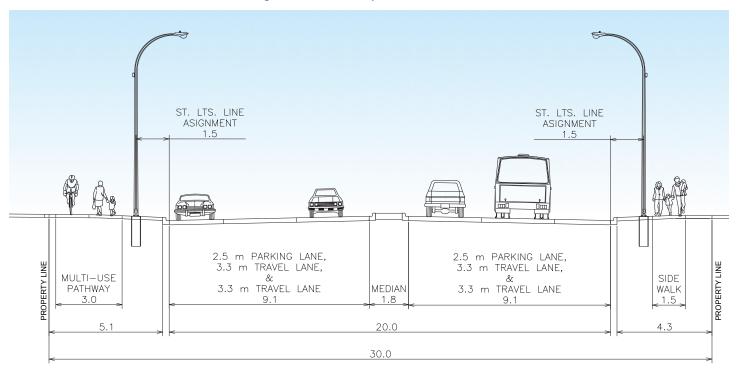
Conceptual Road Cross Section 47th Street at Fairmont Gate
